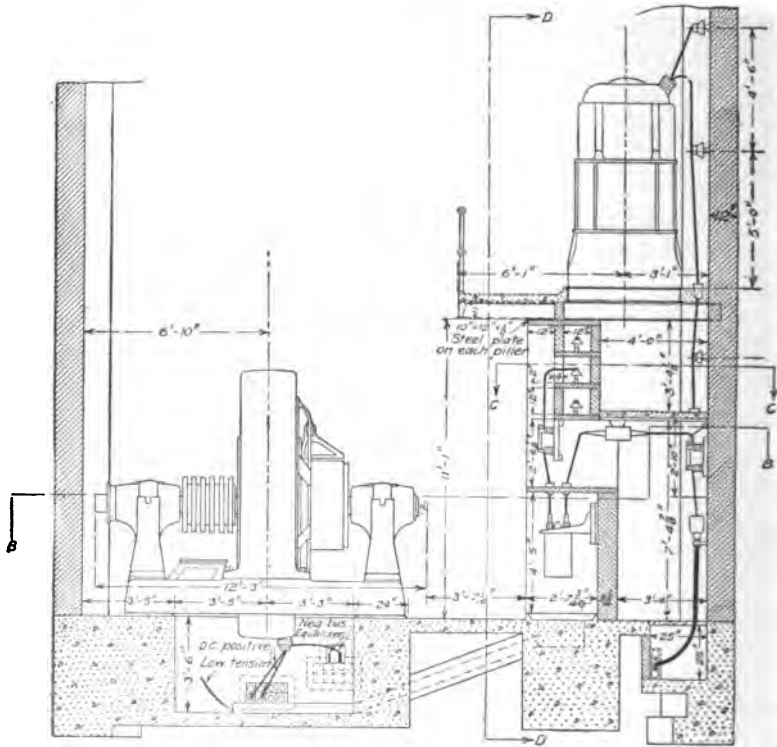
Cross Section of Lightning Arrester House, Long Island Railroad.
